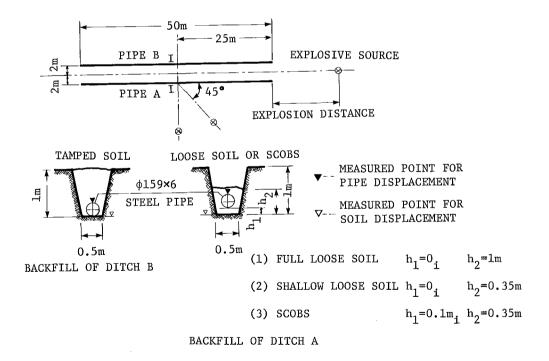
Explosion Test Arrangement for Pipes A and B
